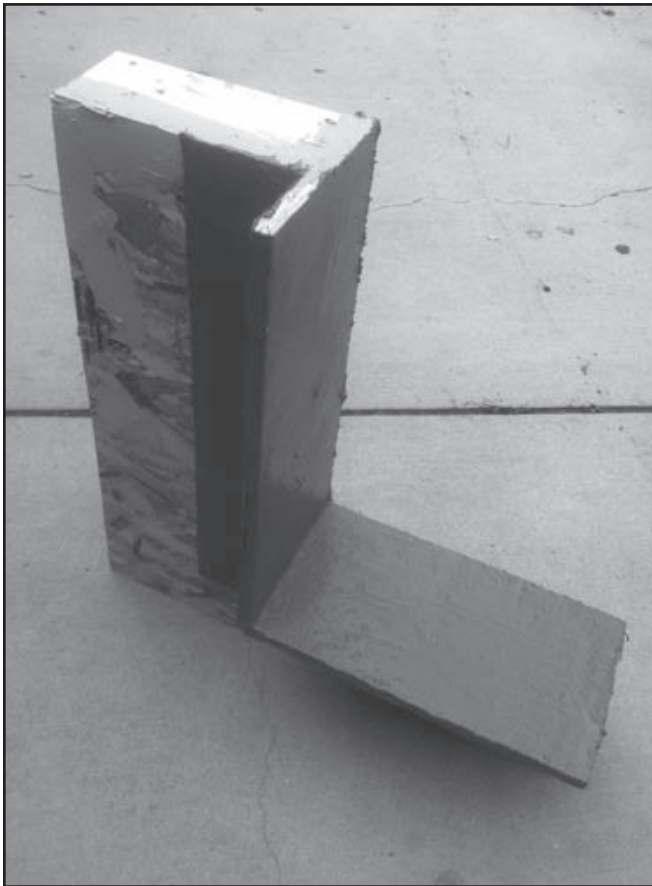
Corner sample with Prosoco wet flashing. Additional insulation will be added to this Passive House Wall assembly to the outside of the OSB, the window buck allows the window to be centered over the outer insulation. Image courtesy Zola Windows.
